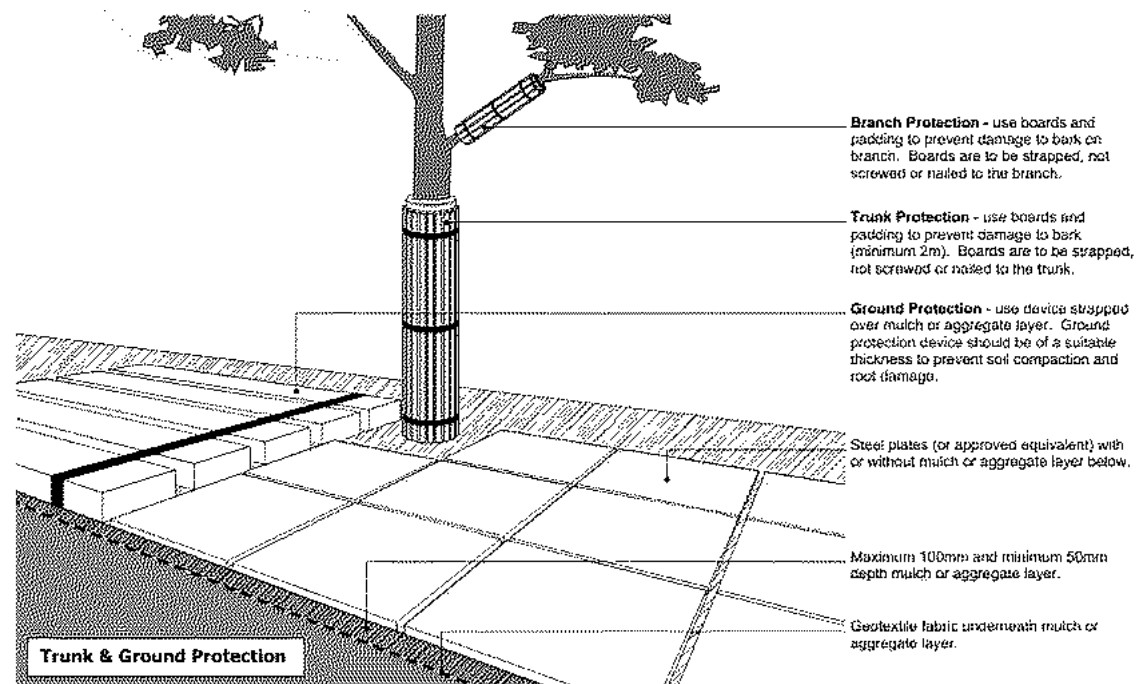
EXAMPLE OF TREE TRUNK AND GROUND PROTECTION
